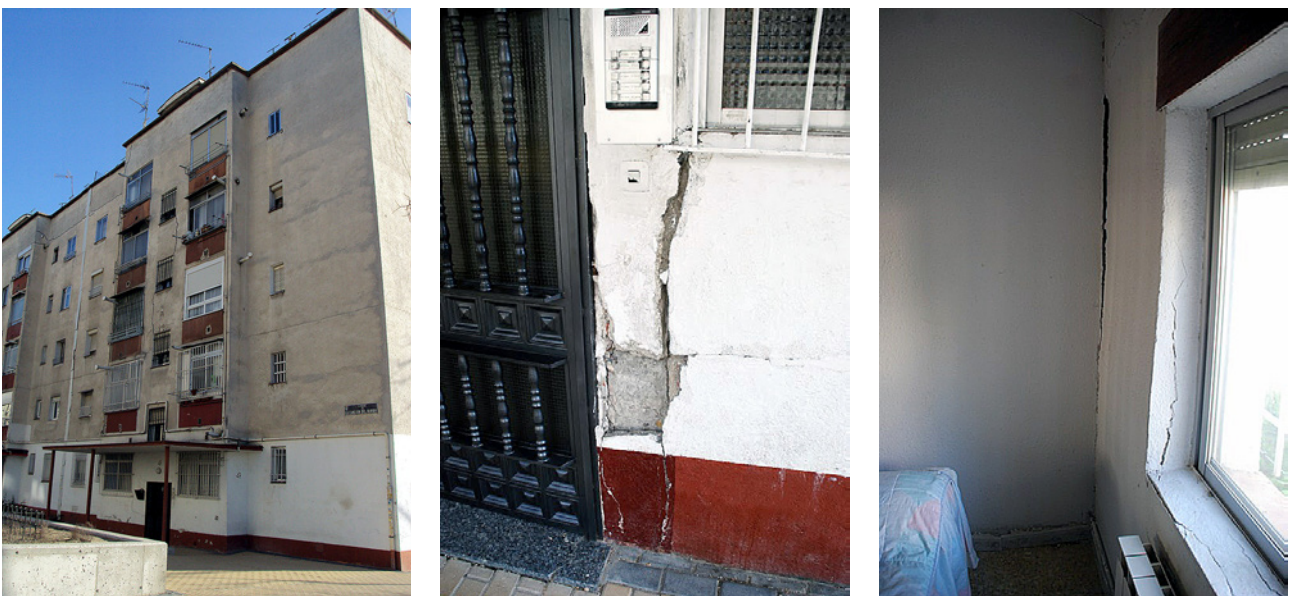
The apartment building before retrofit and cracks assessed during audits.
